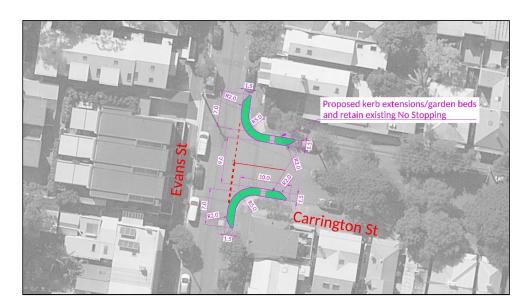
Evans Street / Carrington Street T-intersection proposal.
